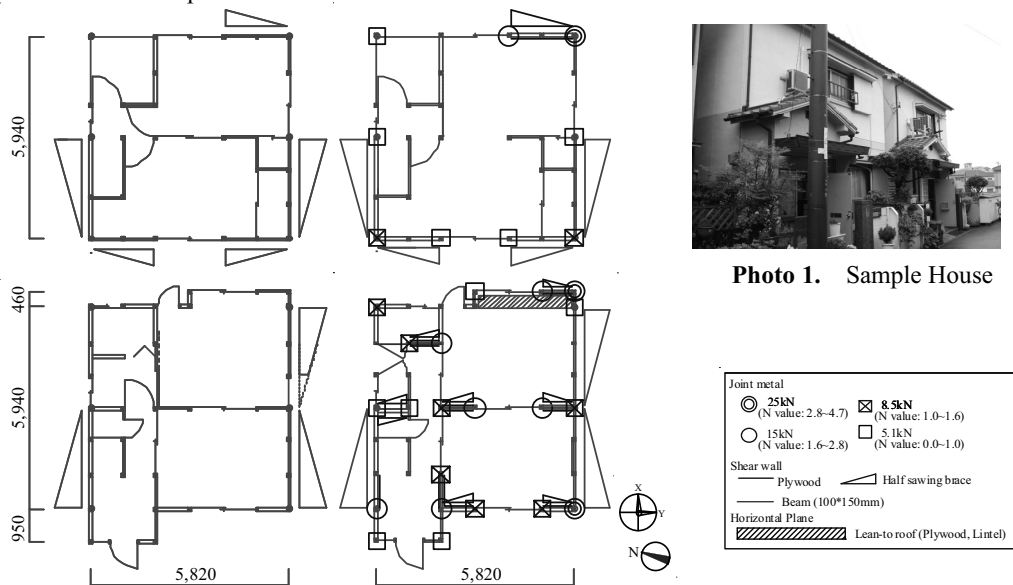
Plan of Specimens (Left : Specimen-A, Right : Specimen-B)
